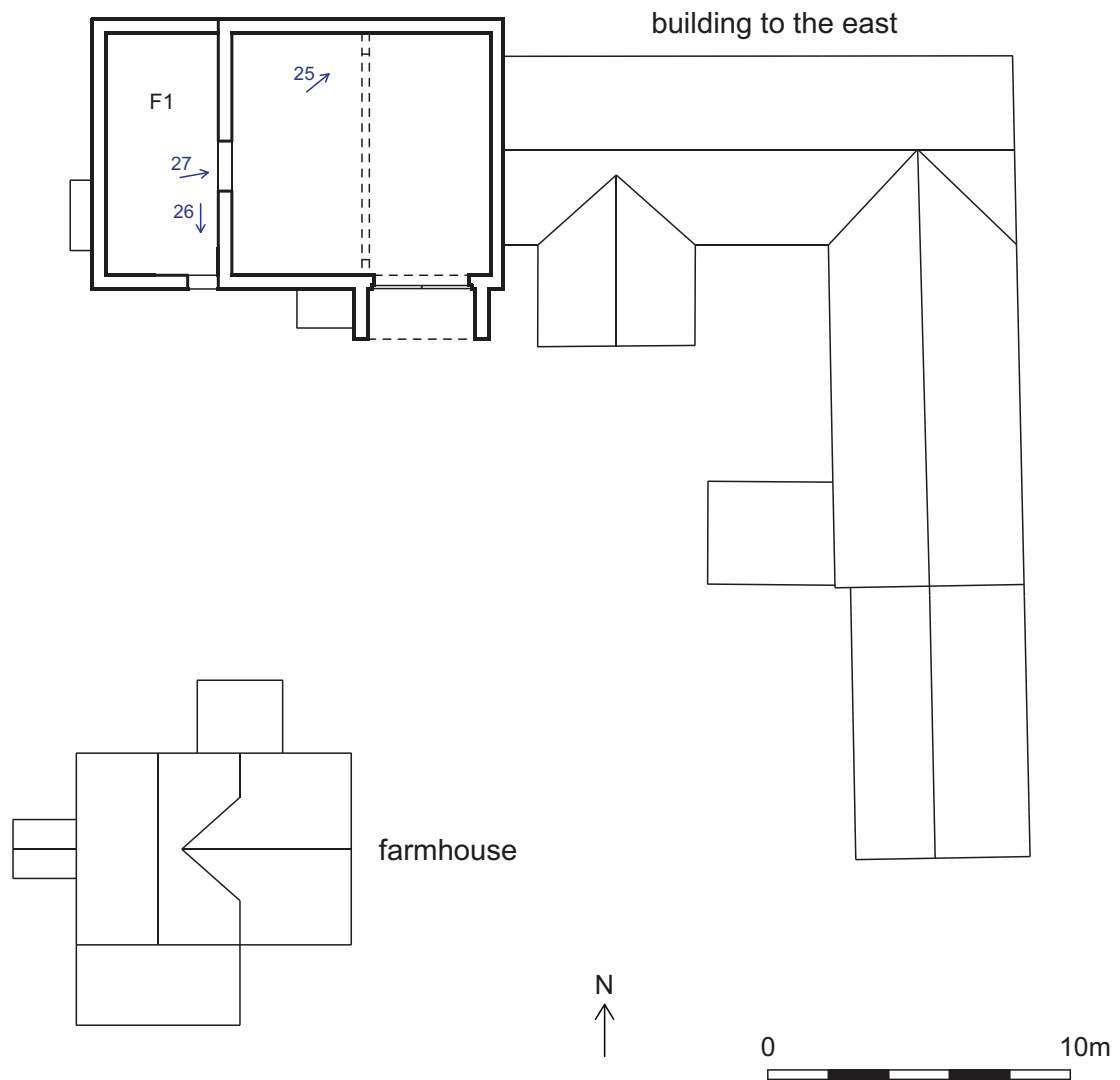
Ground floor plan, showing the location and direction of photographs taken on site
